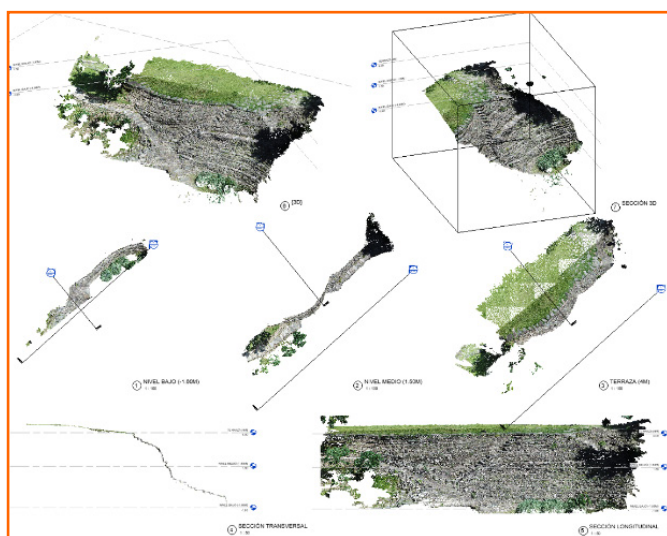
3D models, plan, section and elevation of east retaining wall in central CA, produced from photogrammetry. Photos by A. Burbano, processed by E. Figueredo, 2019.
